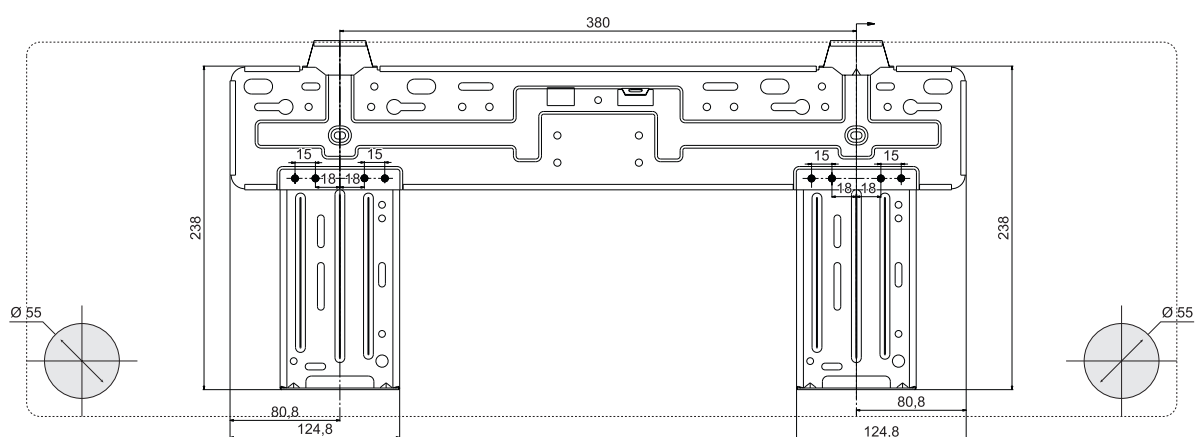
Mounting plate for VAI 6-035 WMNI.
